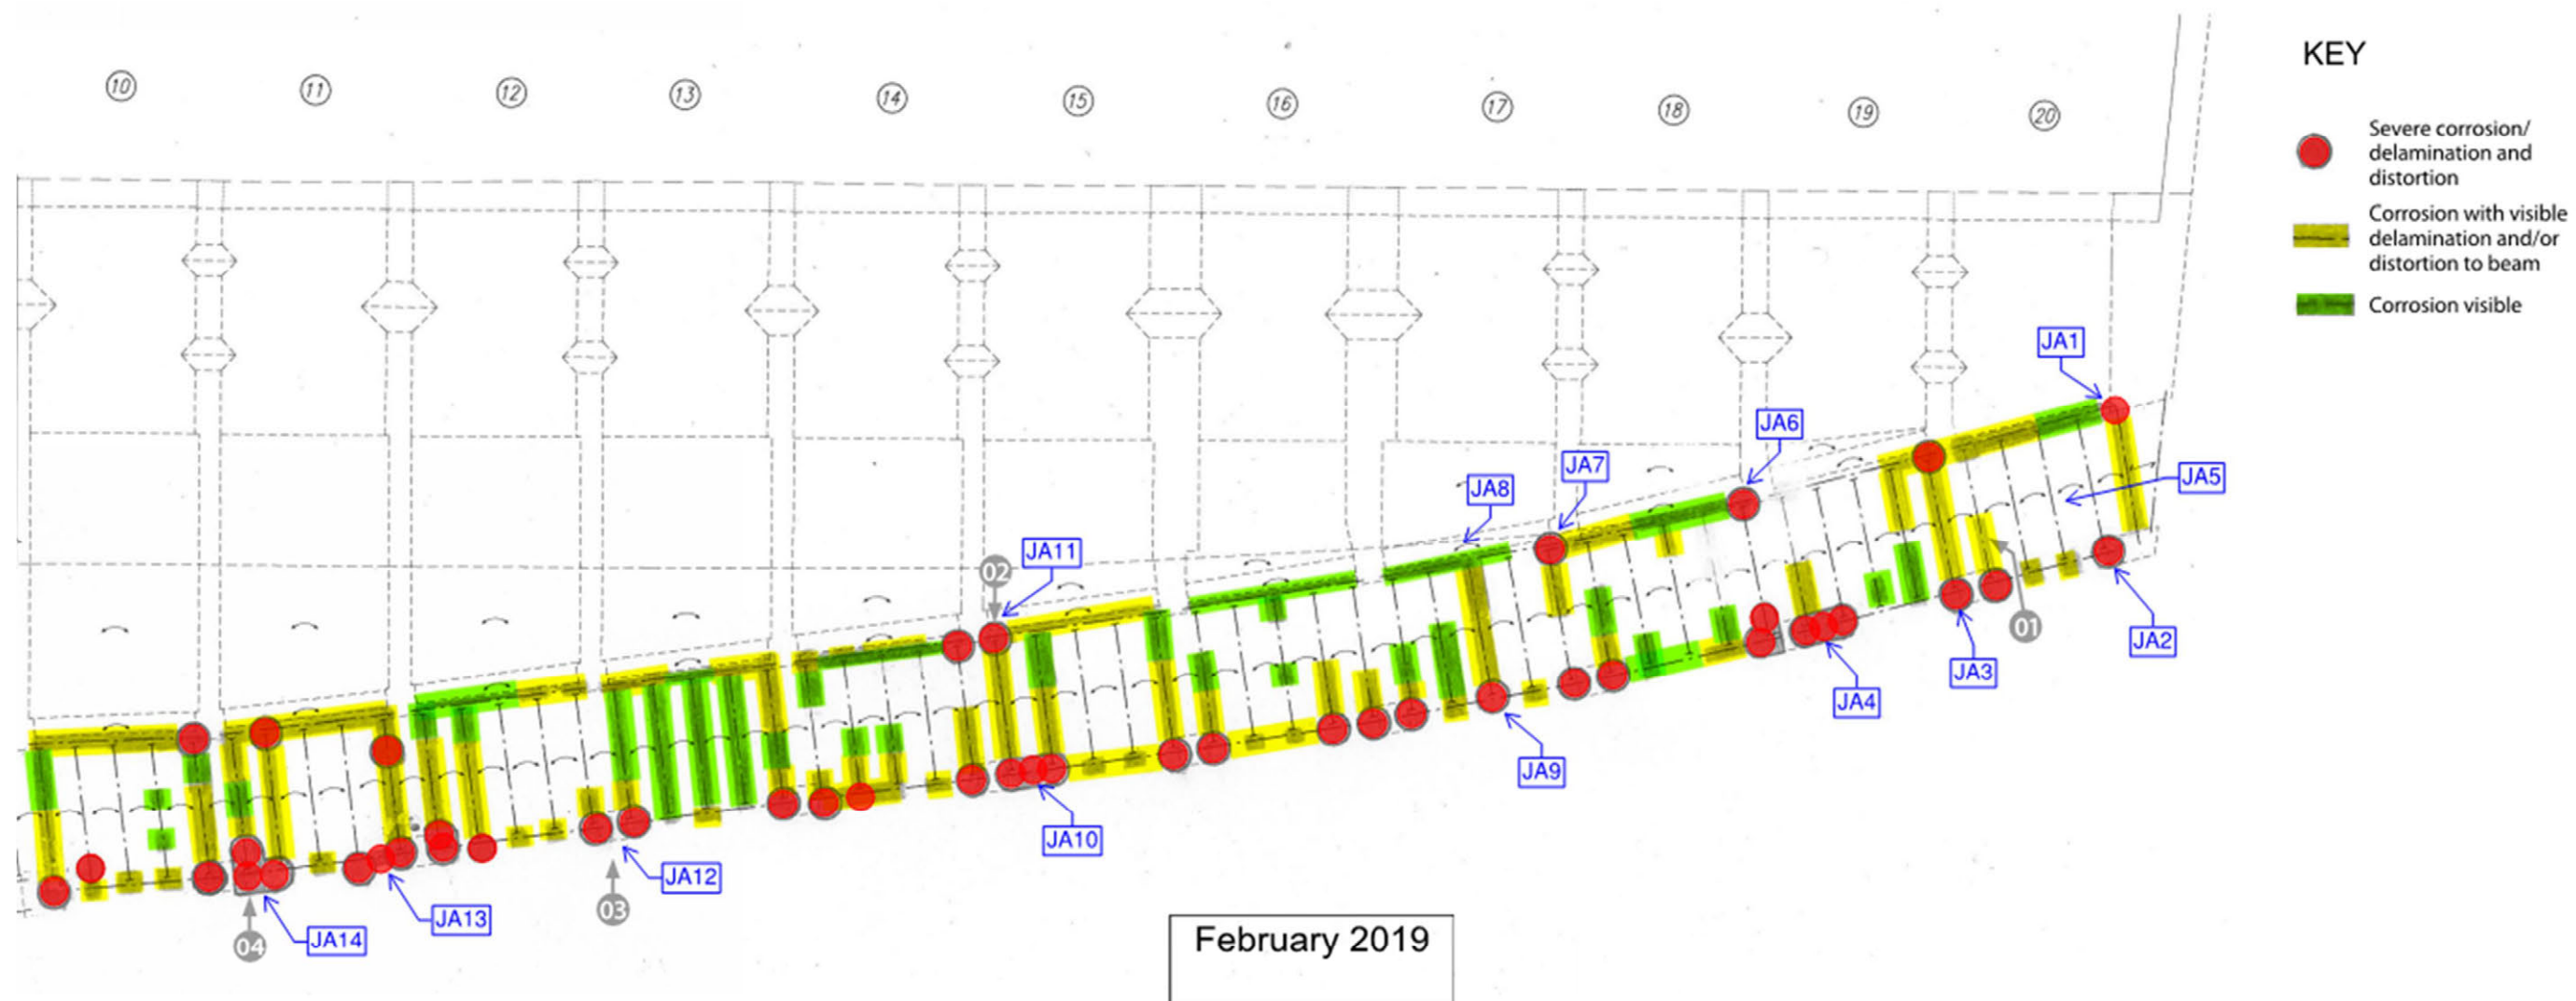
WSP observations 2019 Condition Plan London Road Deck Structure sheet 3 of 3
